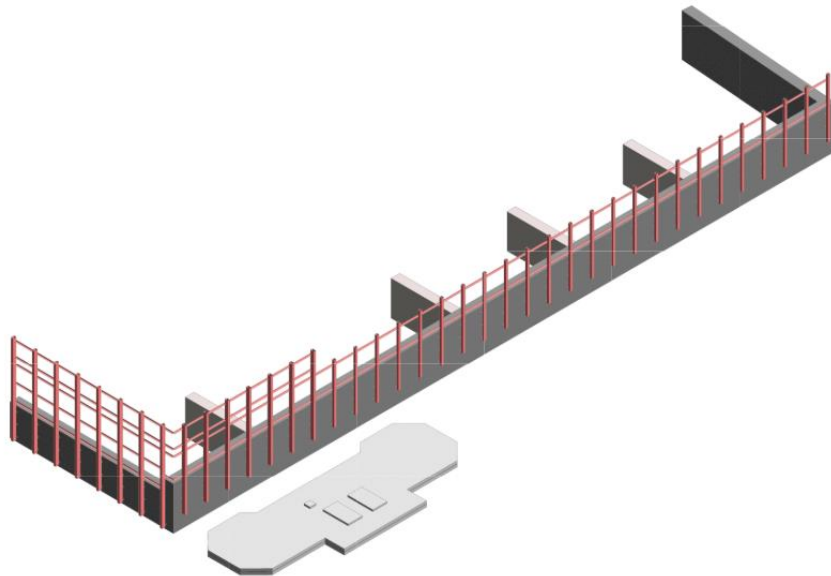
aerial view of push walls, cladding and location of tanks/pump
